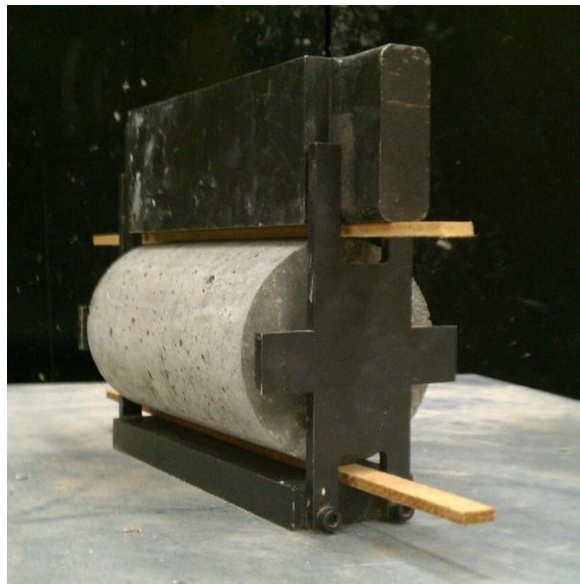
Aligning apparatus and bearing strips used to position splitting tensile strength specimens
